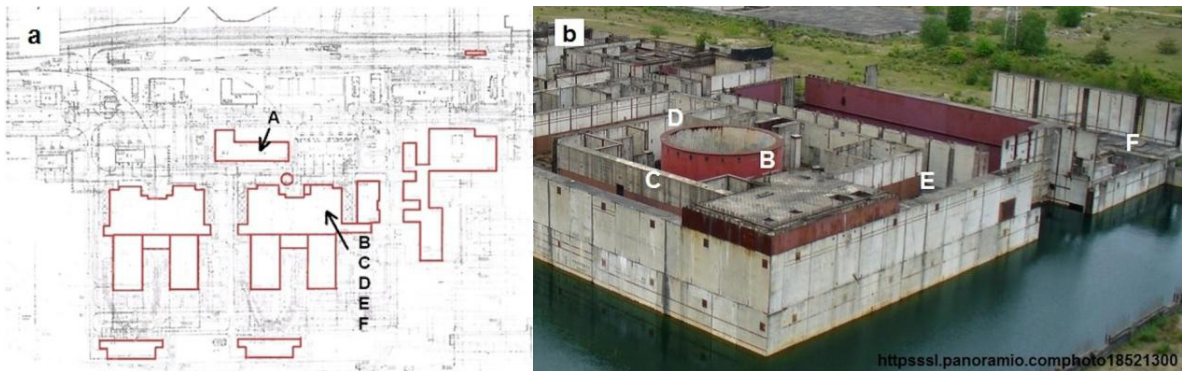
Sketch of building location of unfinished nuclear power plant (a) and an aerial view of a part of the plant with indication of cored structural elements (b); (A...F – notation of core specimen series).
